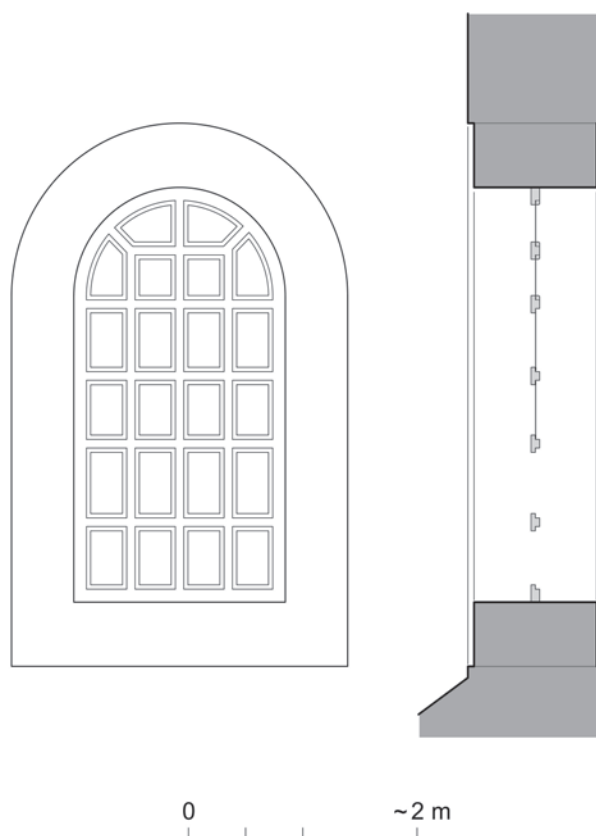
Reconstruction of the round-headed window from Ravenna with wooden frame and glazing bars.
